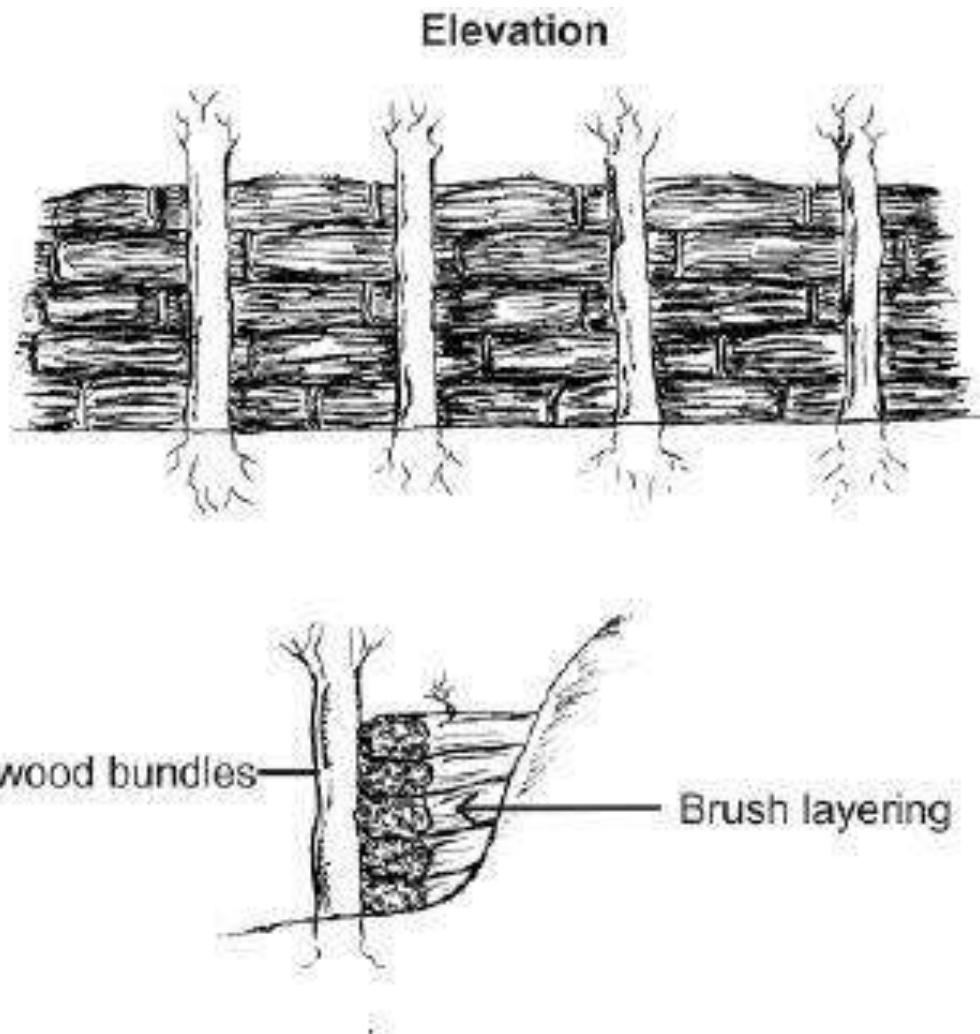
Schematic Diagram of a Live Brushwood Retaining wall
